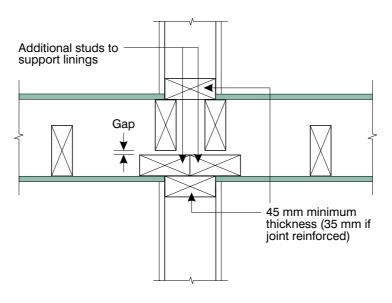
INTERSECTION WITH INTERNAL WALLS
